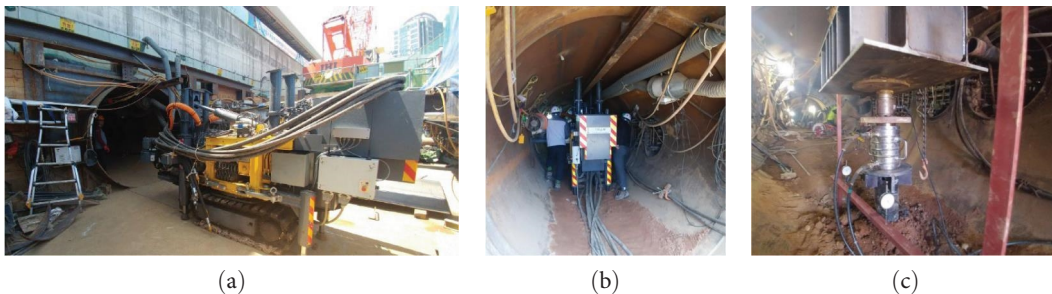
(a) Customized machine TRPM-08 for helical pile installation, (b) working of TRPM-08 machine inside TRcM pile, and (c) static pile load test loading devise with reaction frame and LVDTs.
